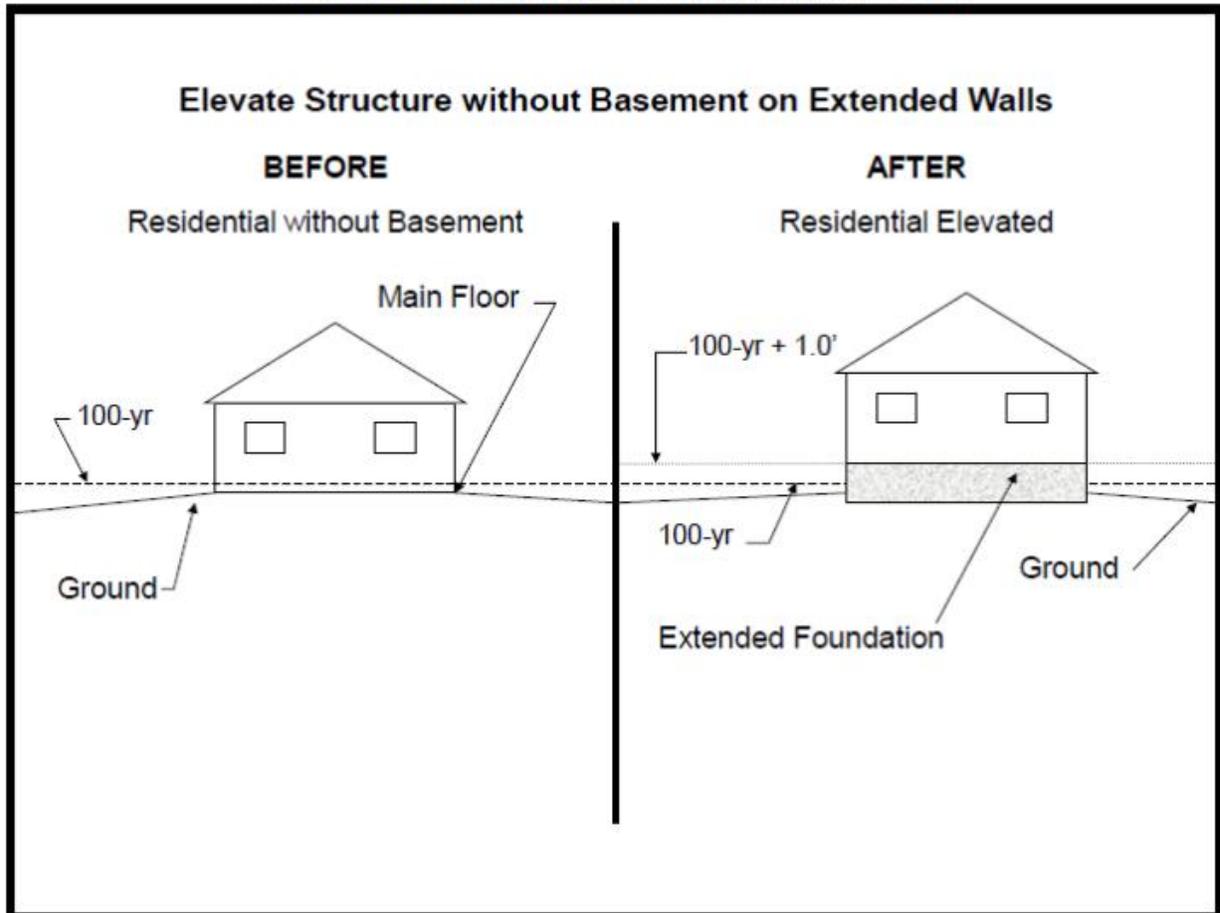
ELEVATION BUILDINGS TO MINIMIZE FLOOD RISK
